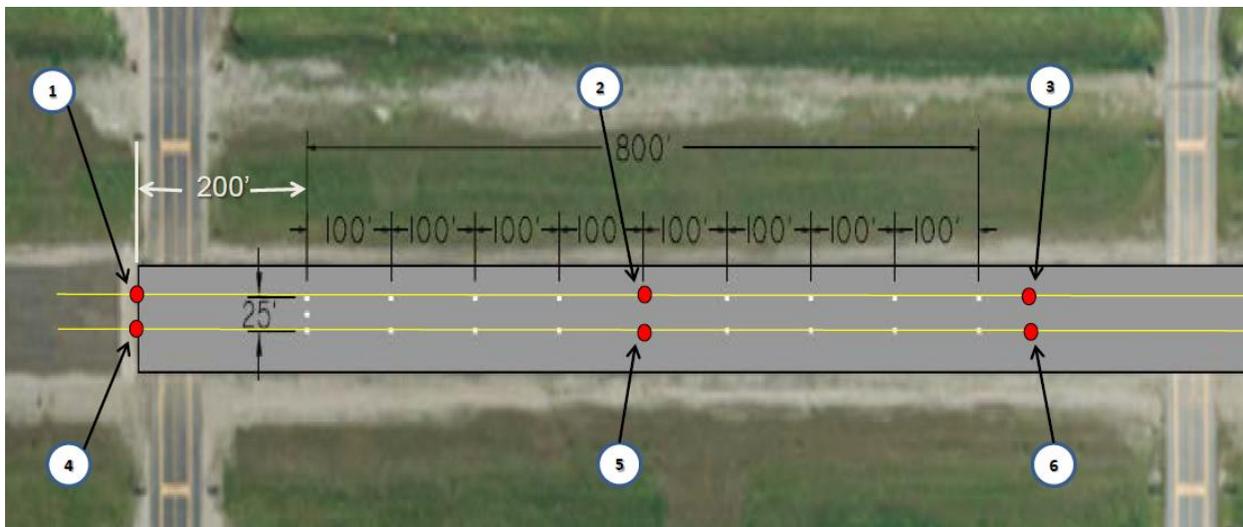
Points to establish on the runway, used for initial layout of marking.
